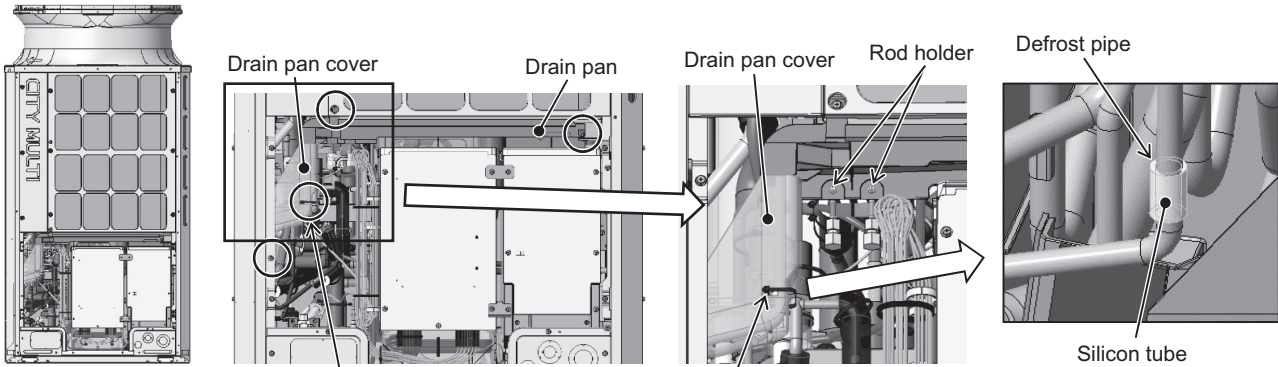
Cut the cable tie. Figure 2 Cut the cable tie. Figure 3
